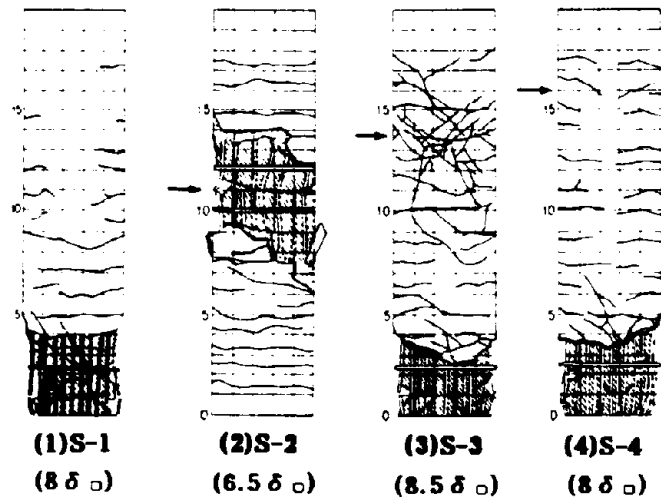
Reinforced Concrete Wall Type Pier Specimens with Shear Span Ratio of 7.1 to study Strengthening Method by Means of A Steel Jacket
